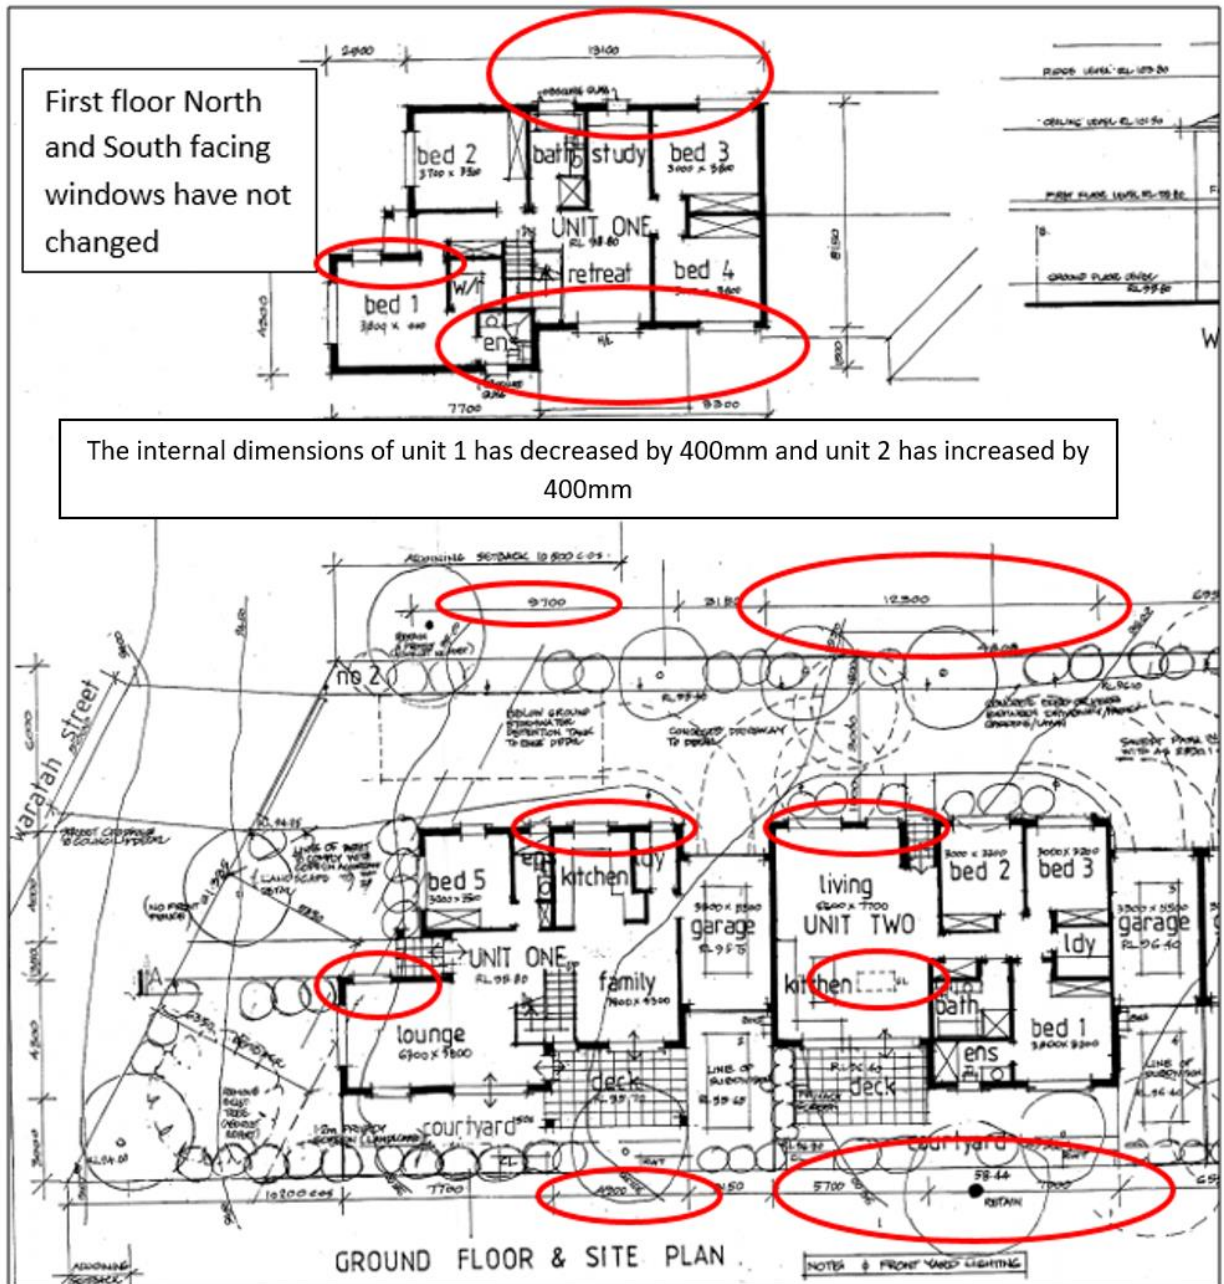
Amended plans. The red indicates the proposed amendments to the plan.
